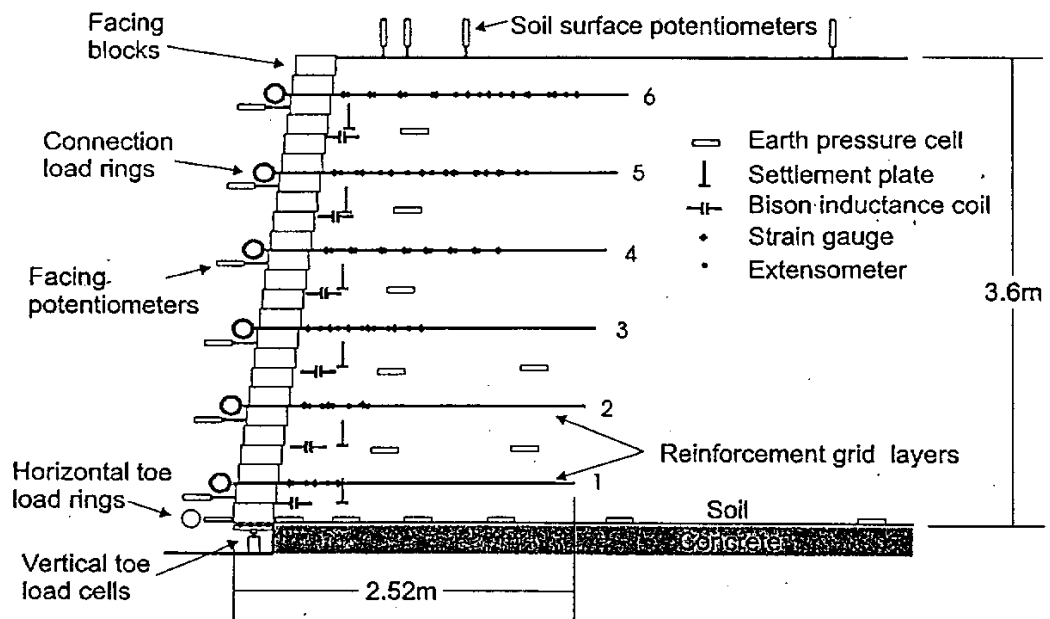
Typical cross section of the RMCC test walls with instrumentation layout (after Burgess, 1999).
